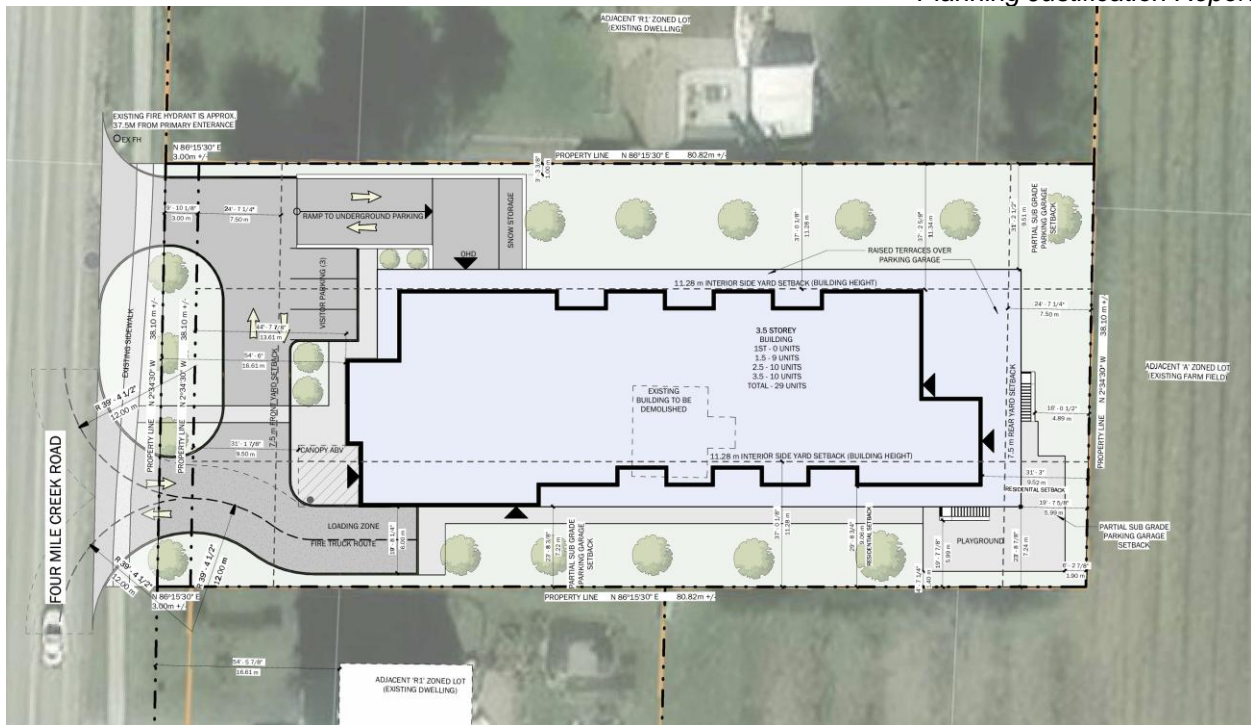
Site Plan showing the proposed development. The light blue area is the proposed development with the thin black line being the extent of the parking garage portion and the thick black outline reflecting the extent of the apartment building portion located above the parking garage.
